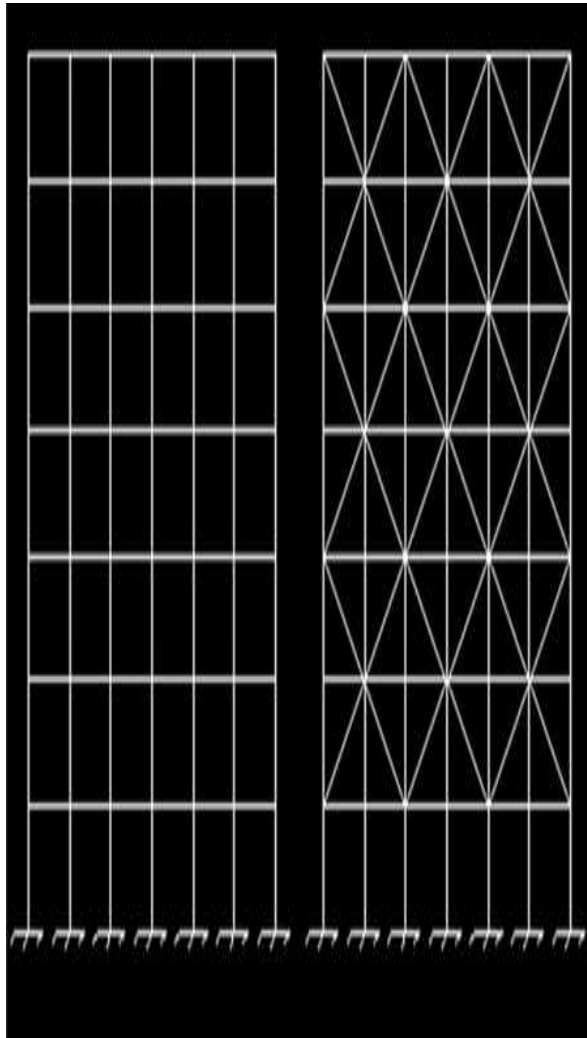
(a) Typical Layout (MODEL 1 and 2)
